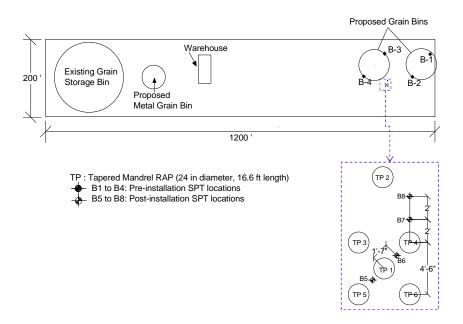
Reynolds, IN: Pier and SPT locations plan layout
